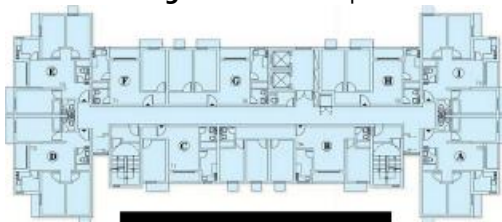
Floor Plan, Floor 2-23, Block 1, EDF. de Alameda da Tranquilidade
